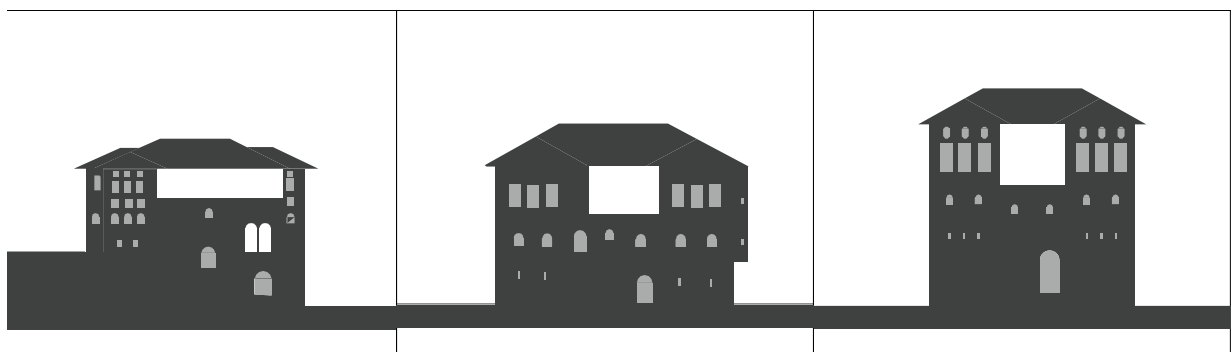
, Analyses of signif cant voids in house yards' doors of Gjiokastra and house facades according to the typology. (source: author's)
